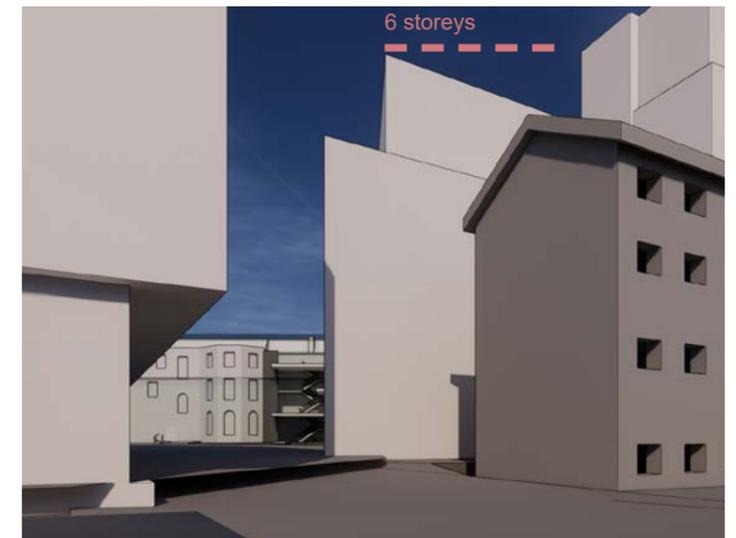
View E from new square to rear of Town Hall with 5 storeys to new civic/ commercial building. 5 storey form is similar in scale to the Town Hall Building
